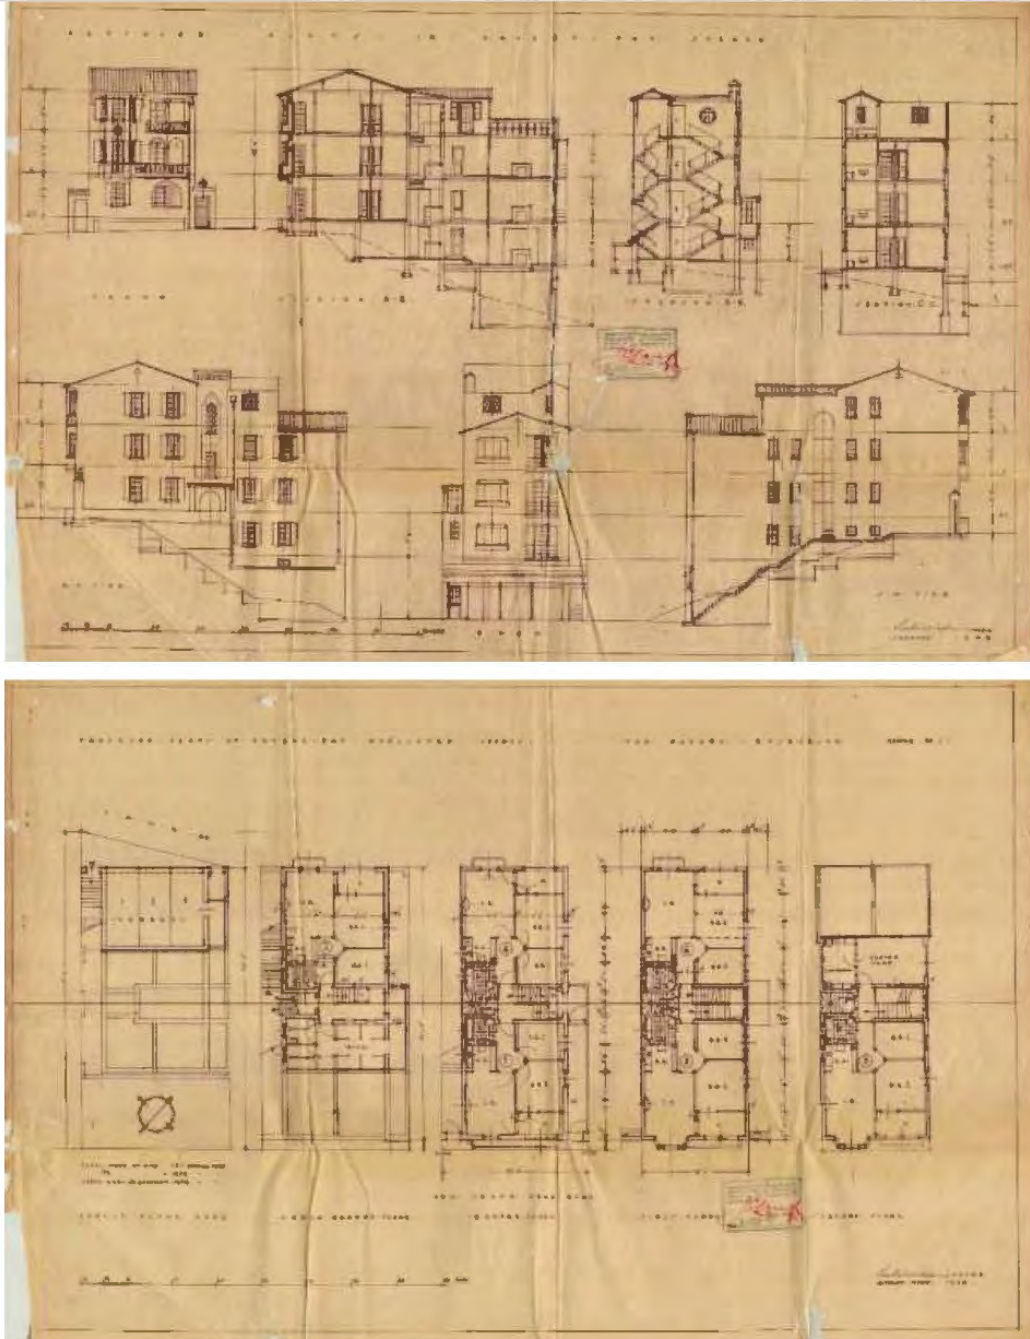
Architectural plans submitted with BA45/1934 (Source: Woollahra Records)
